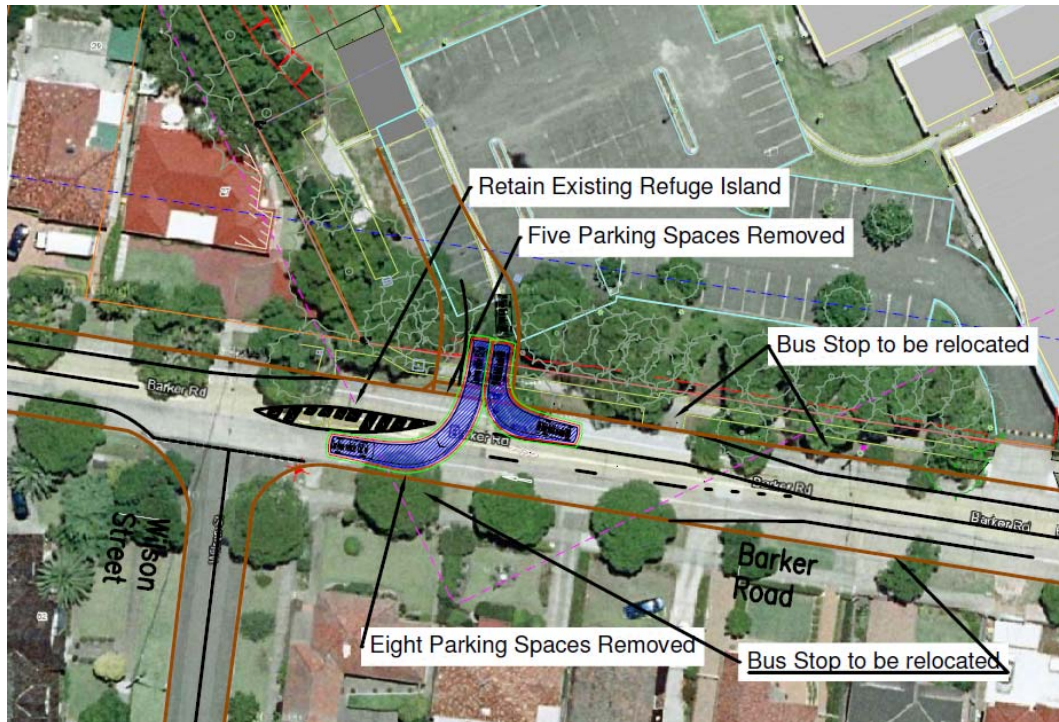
Proposed Right Turn Bay at Underground Car Park Access
